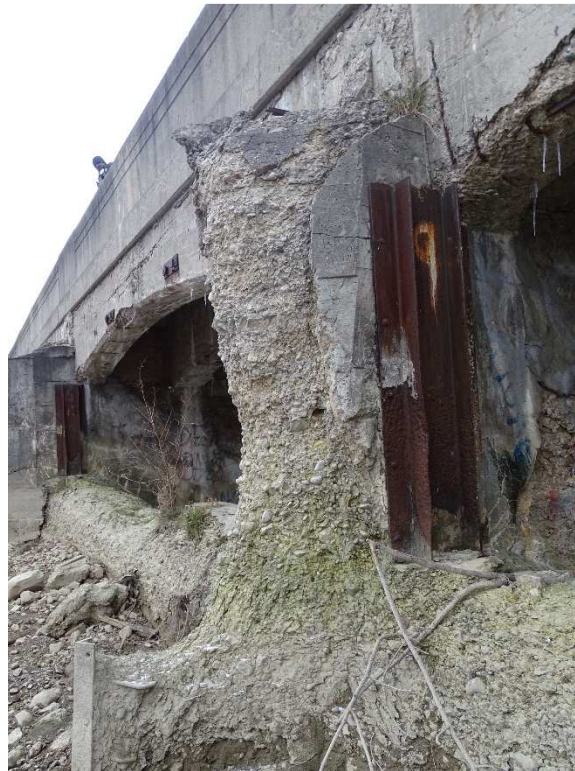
Destroyed and Very Severe Spalled Concrete - Upstream of Pier 1 Looking South
